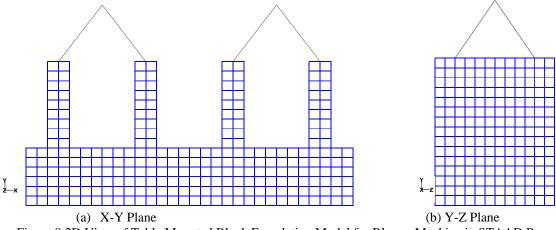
2D View of Table Mounted Block Foundation Model for Blower Machine in STAAD.Pro
